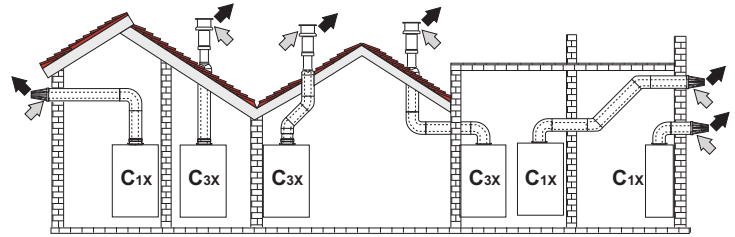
Examples of connection with coaxial pipes (⇨ = Air / ⇨ = Fumes)
